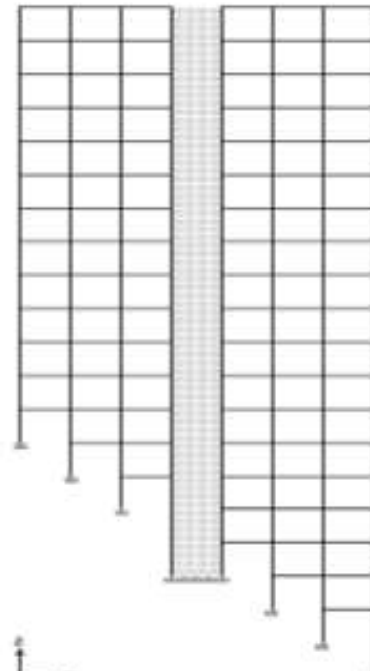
Model 3-Building on Sloping Ground with Shear wall.
